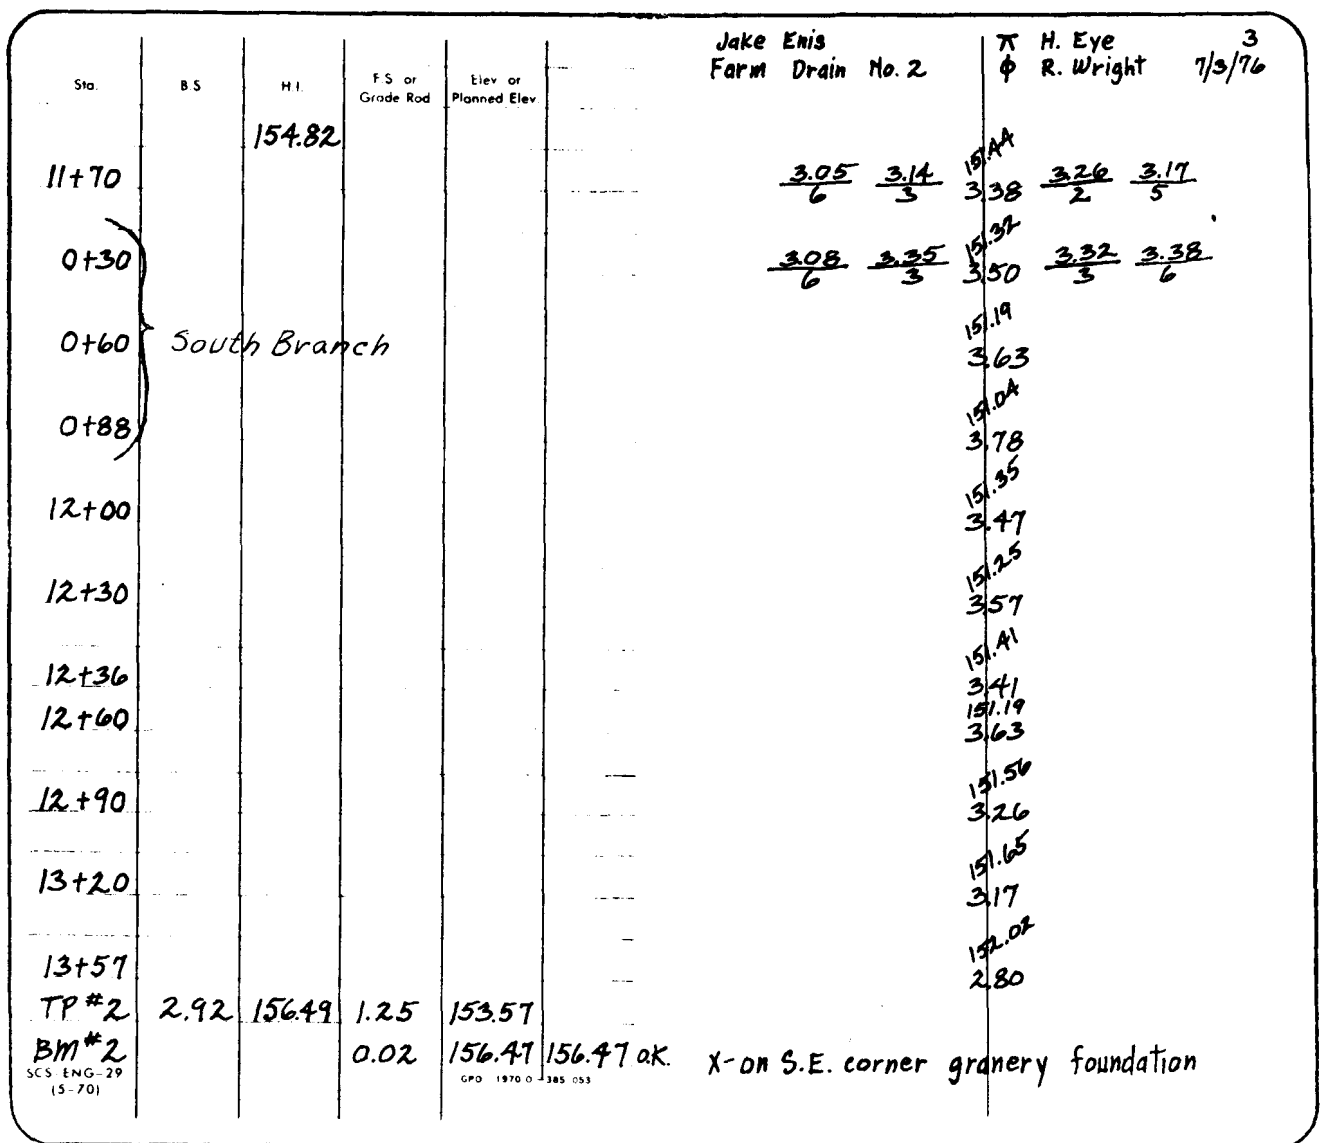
Survey notes—profile and cross section (metric)—continued.
